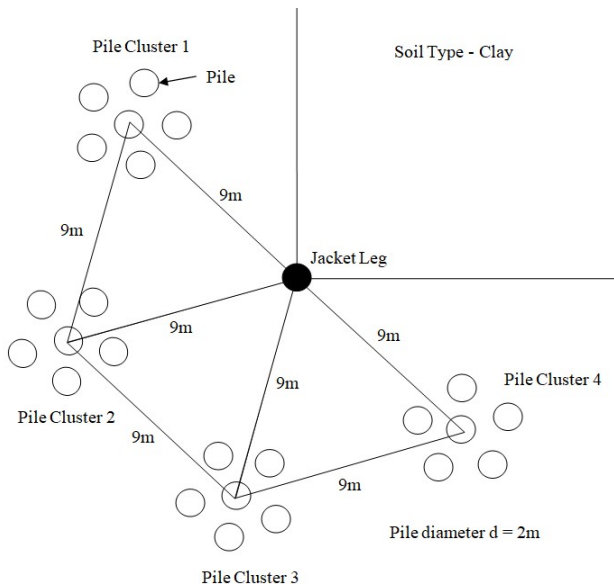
Plan view of skirt piles configuration at base of jacket structure in clay
